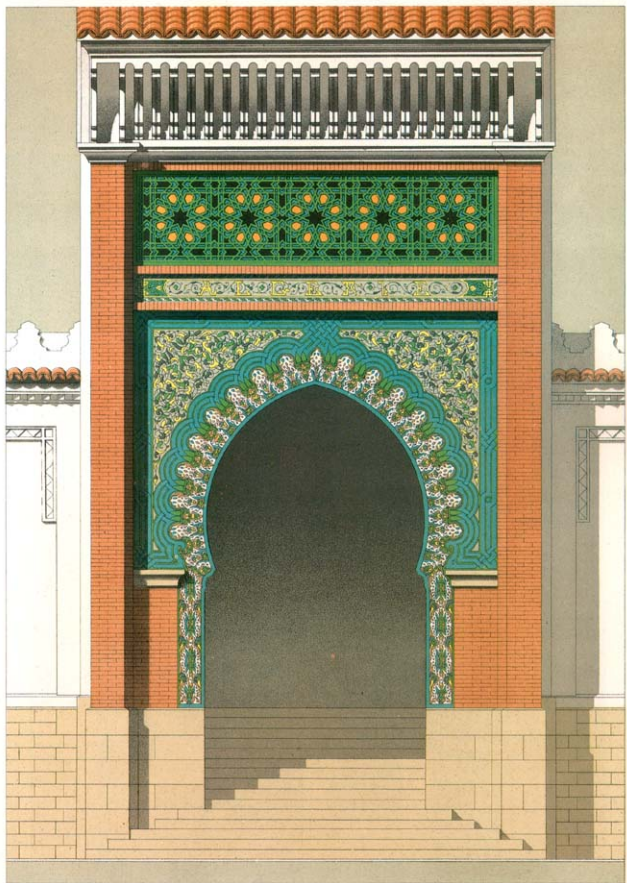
Ministry of Works building, 1878 fair; architect: de Dartein.
